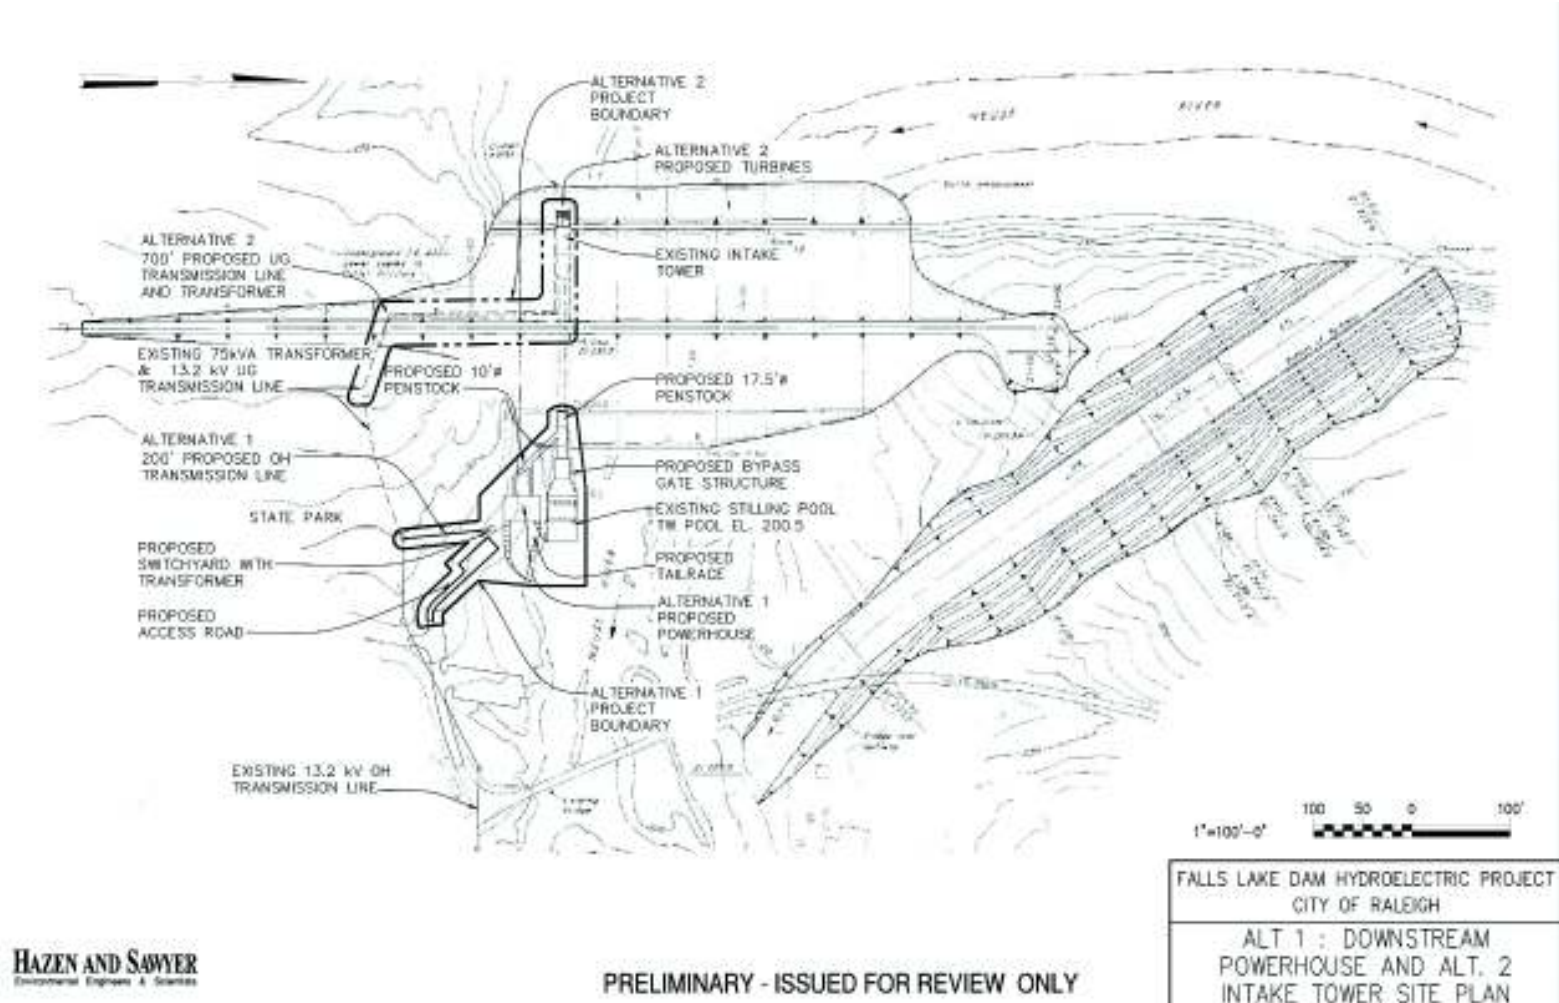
Alternative 1: Downstream Powerhouse – Plan and Section
